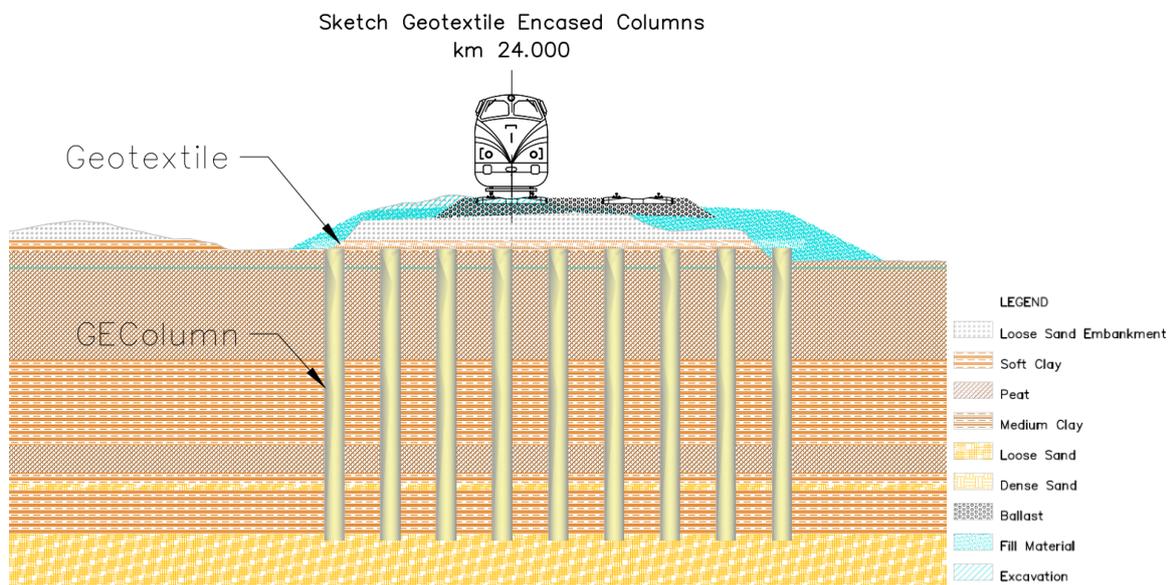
Sketch of the Geotextile Encased Column Stabilization Method at km 24.0 (not to scale)
